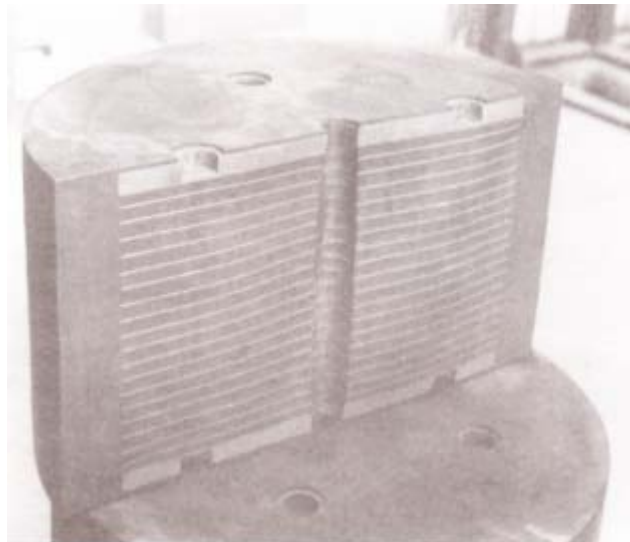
Section of a laminated rubber bearing (Courtesy of I.D. Aiken)
